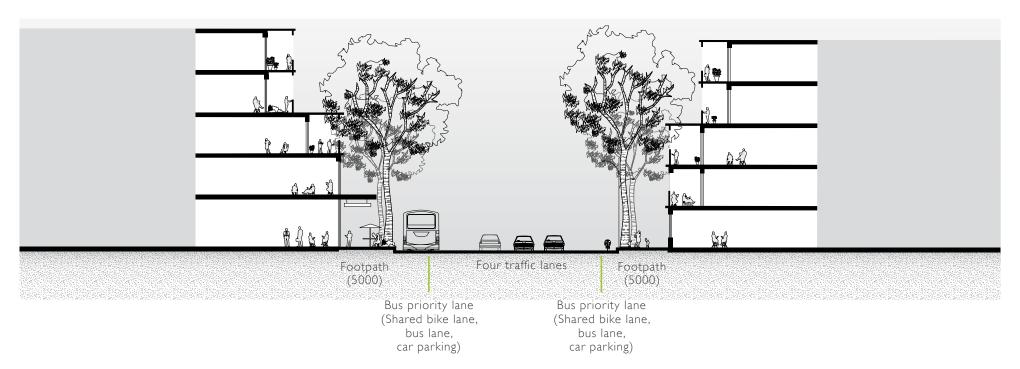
INDICATIVE CROSS SECTION OF TRANSIT BOULEVARD - CITY ROAD
